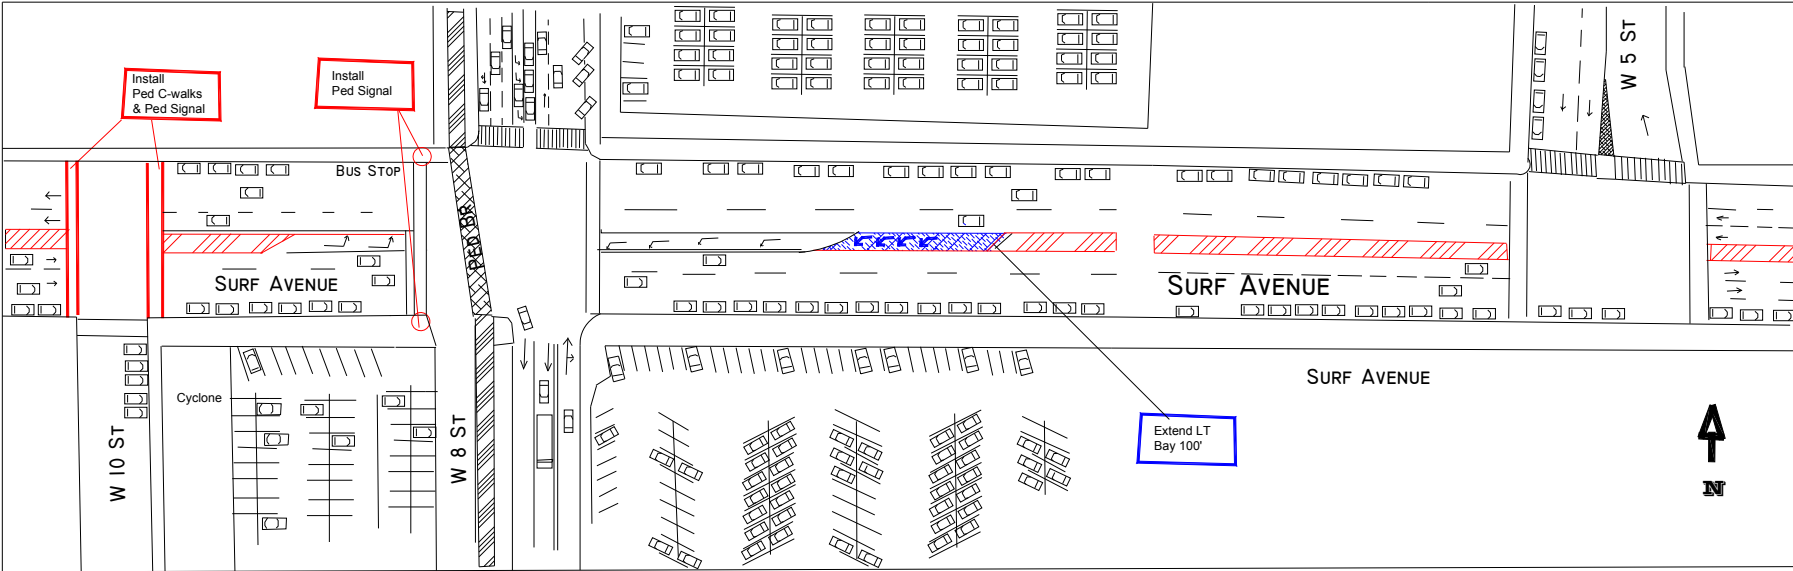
Surf Avenue from West 8th Street to West 10th Street - Proposed Condition
